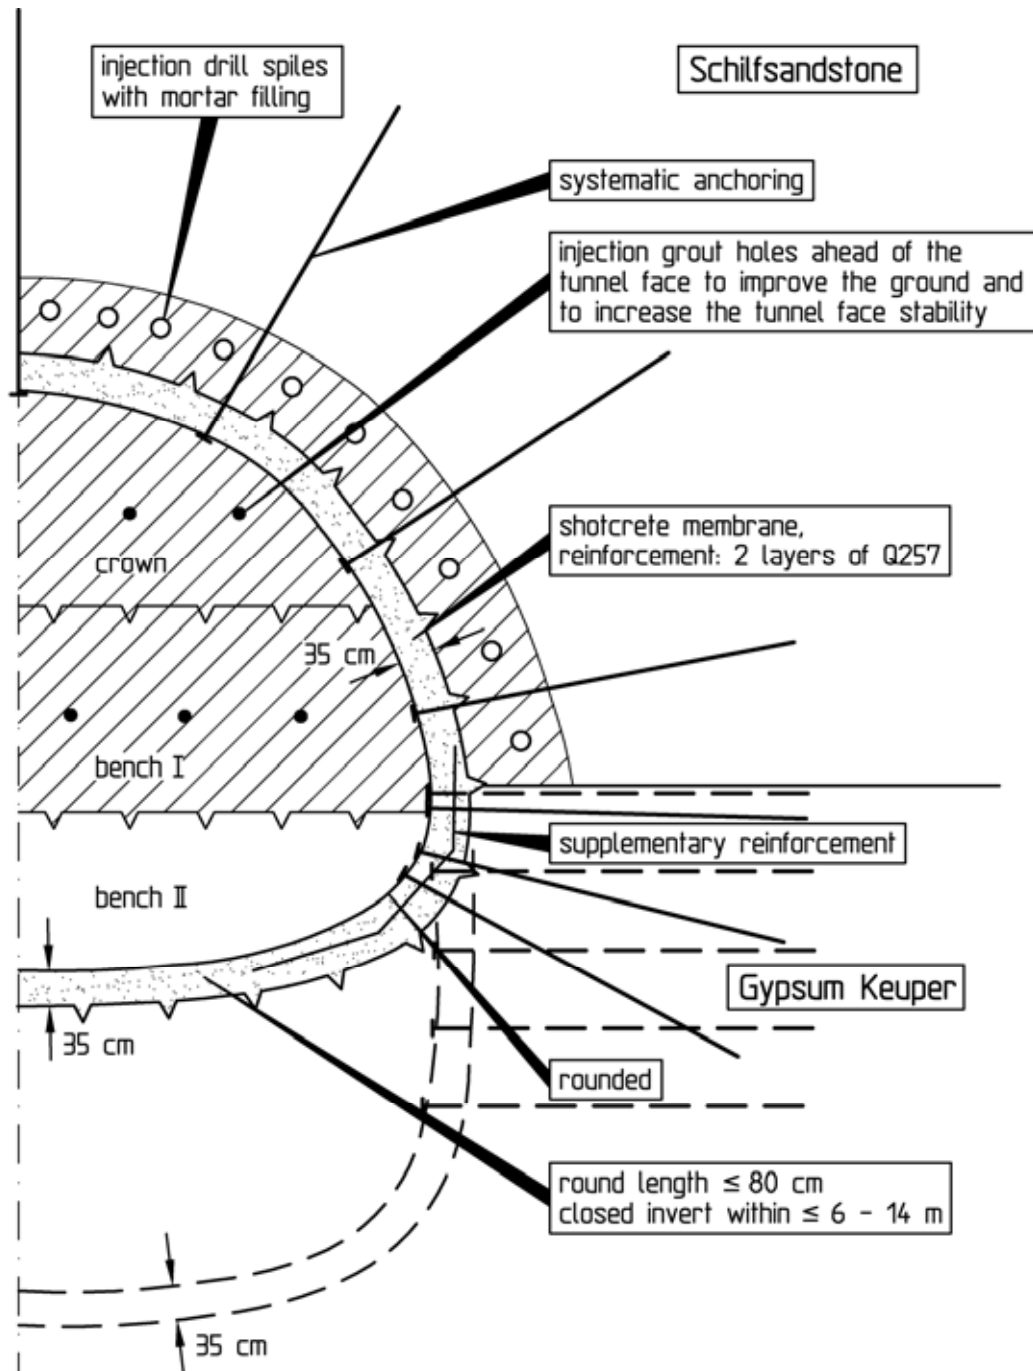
Excavation and support within the area of enlarged cross-section, construction
